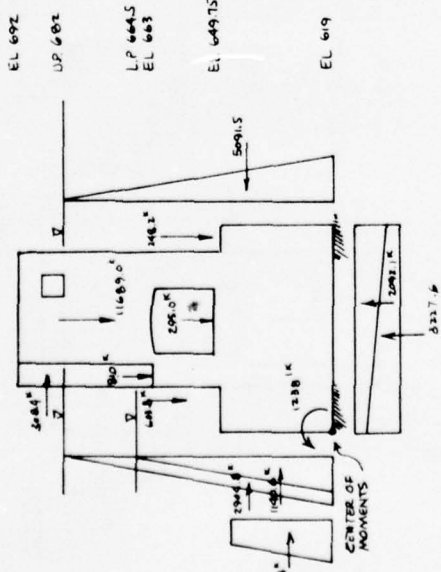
RIVER WALL - UPPER GATE MONOLITH R-12
